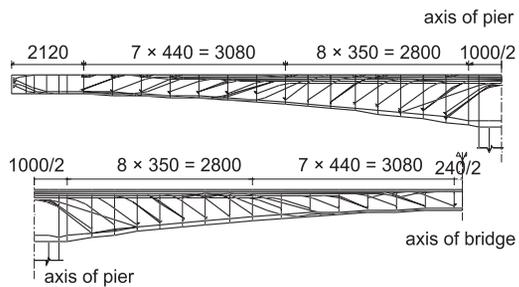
Layout of the internal prestressing system in the right-deck bridge, cm
